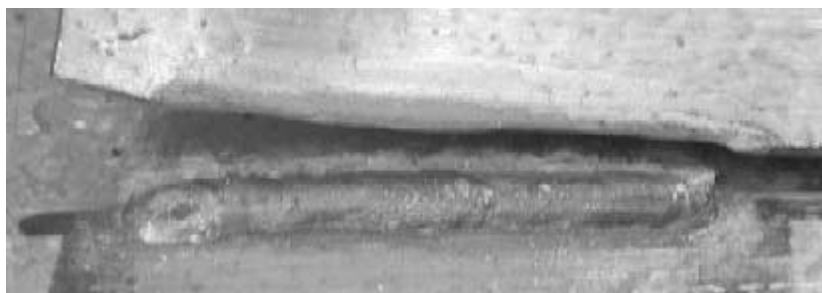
HAZ failure of a single-lap longitudinal fillet welded connection in 1.5-mm sheet steel
